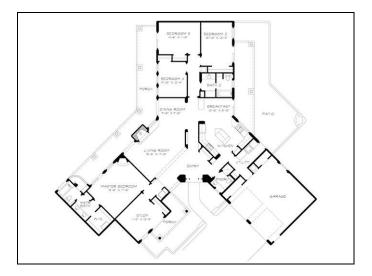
Contemporary American Floor Plan offering. http://houseplansandmore.com/homeplans/houseplan095D-0044.aspx.
